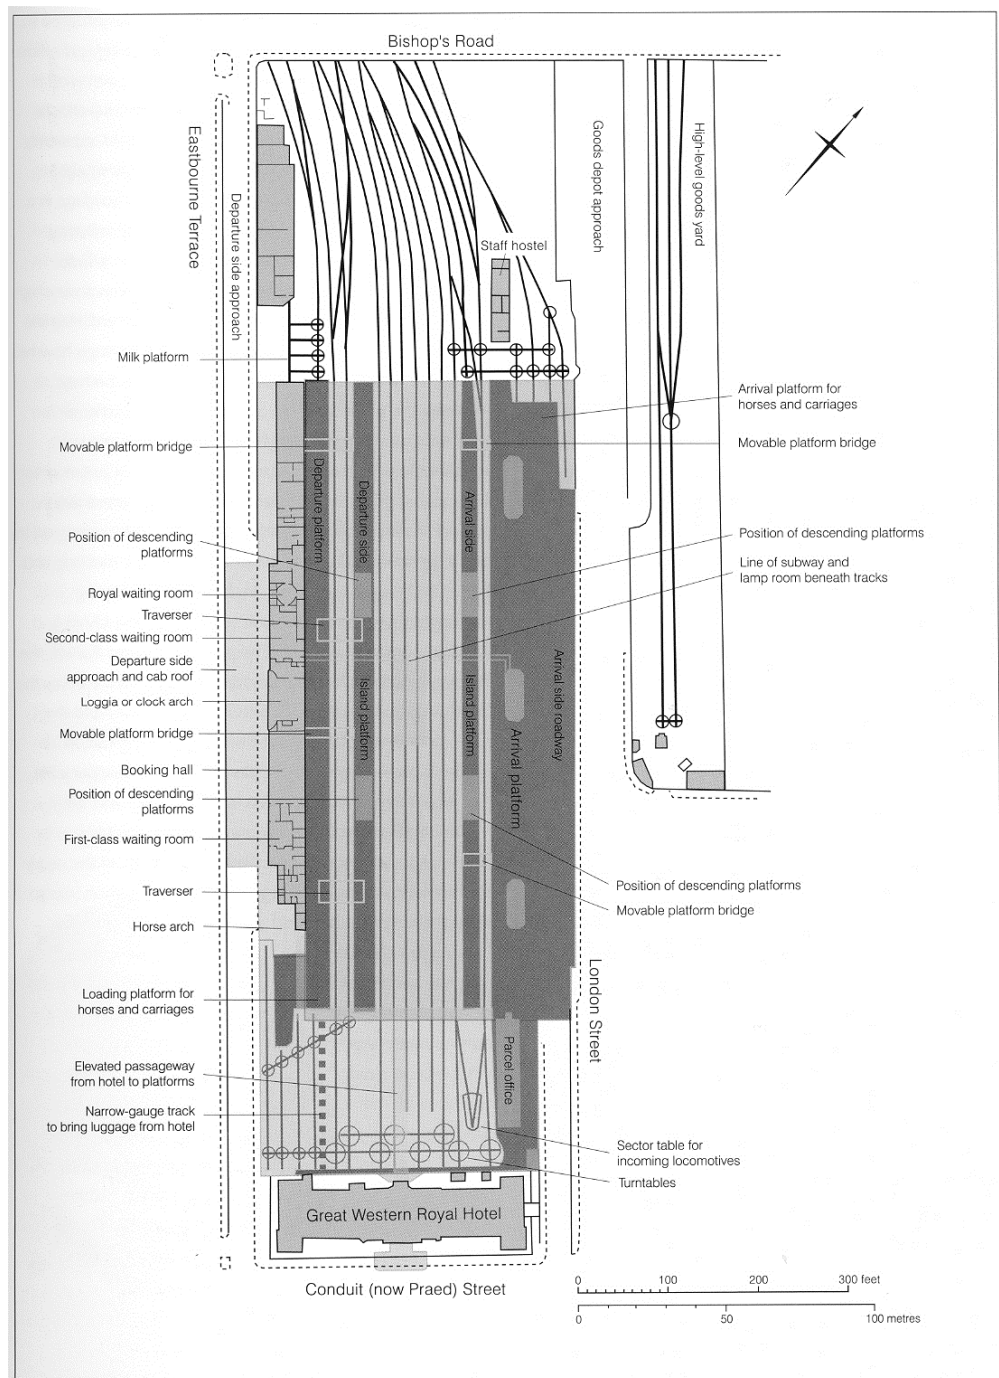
Paddington Station, London, ground floor plan, 1854* (Source: Steven Brindle, *Paddington Station: Its History and Architecture* (Swindon: English Heritage, 2004), p. 35)
